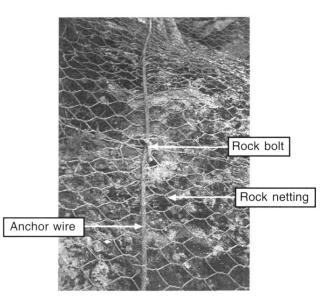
Rock Netting Firmly Fixed to the Rock Slope Surface by Rock Bolt with the Help of Anchor Wire at Location 5
